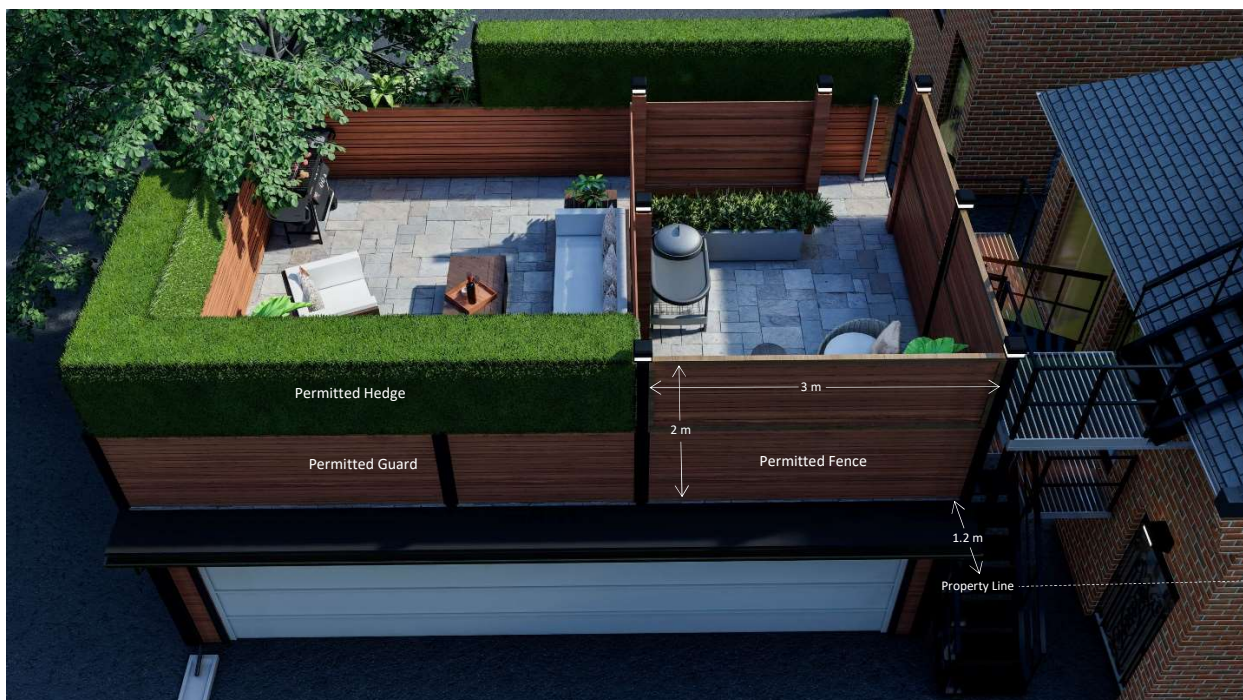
Elevated view of the deck noting Hamilton Fence By-law compliance.
